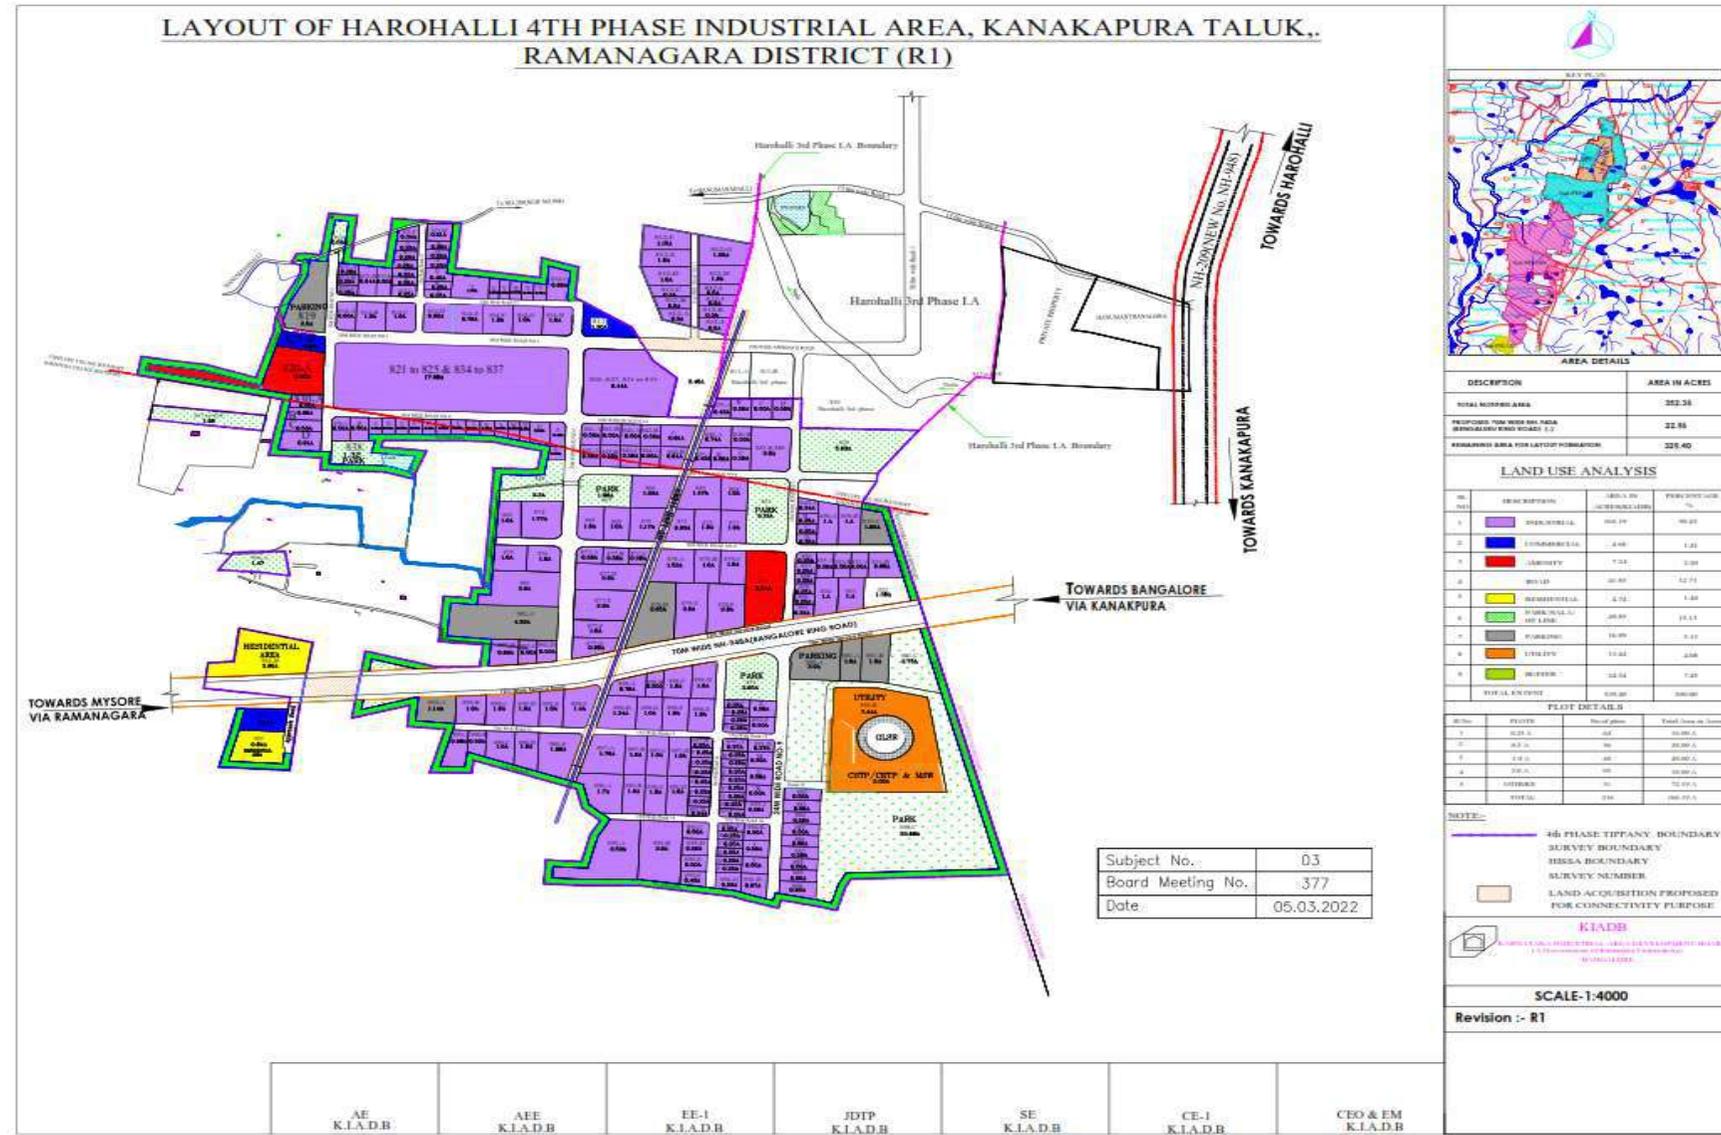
Proposed site layout of 4th Phase Horahalli Industrial Area
